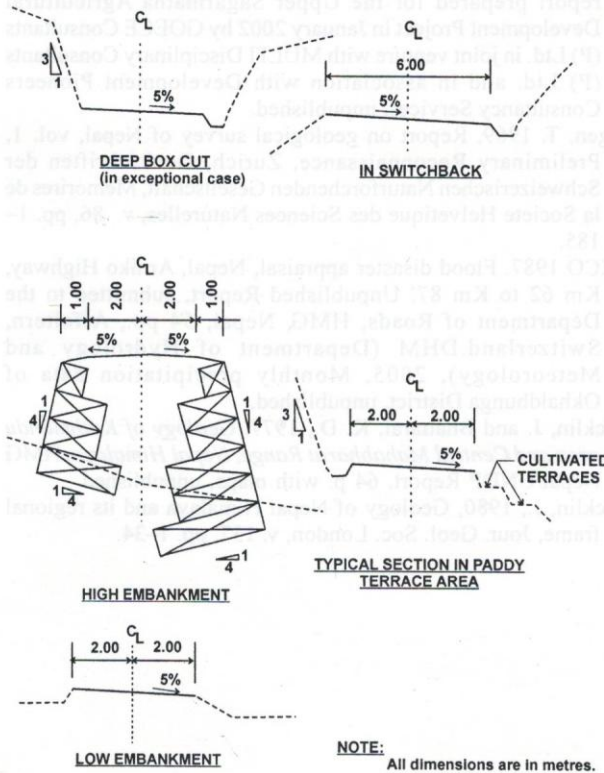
Typical cross-sections for JDEFR (GEOCE et al. 2002). Note missing walls on soil slopes of box cut.
